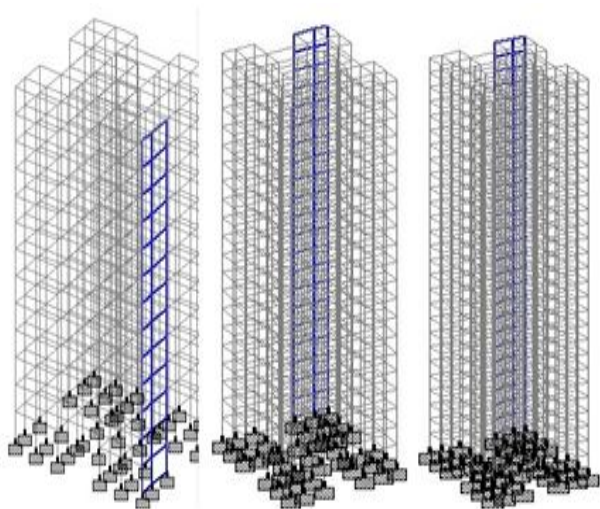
G+12, G+20 and G+26 Building Shear wall structure
